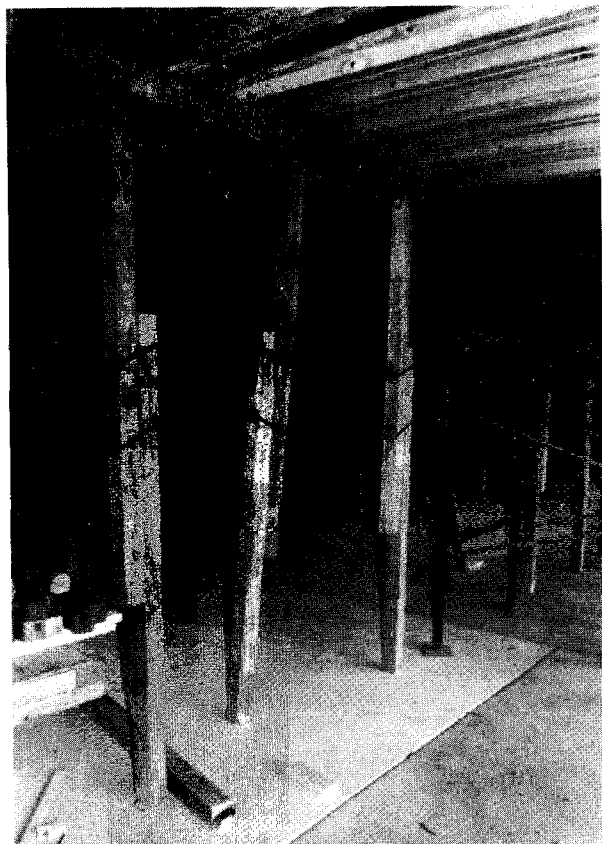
Out-of-Plumb Shore Installation in Formwork
